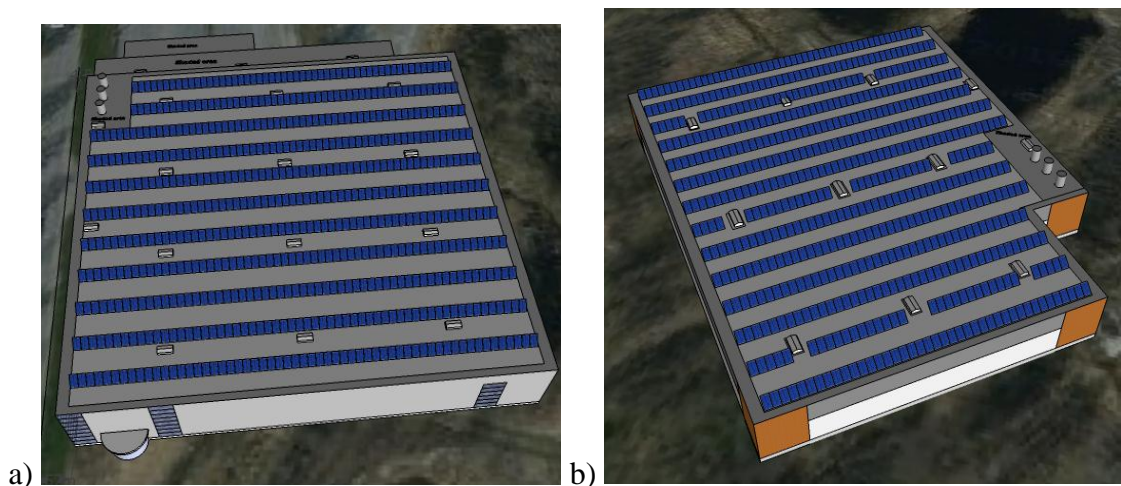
Final PV-array layouts for max option of a) building 1 and b) building 2
